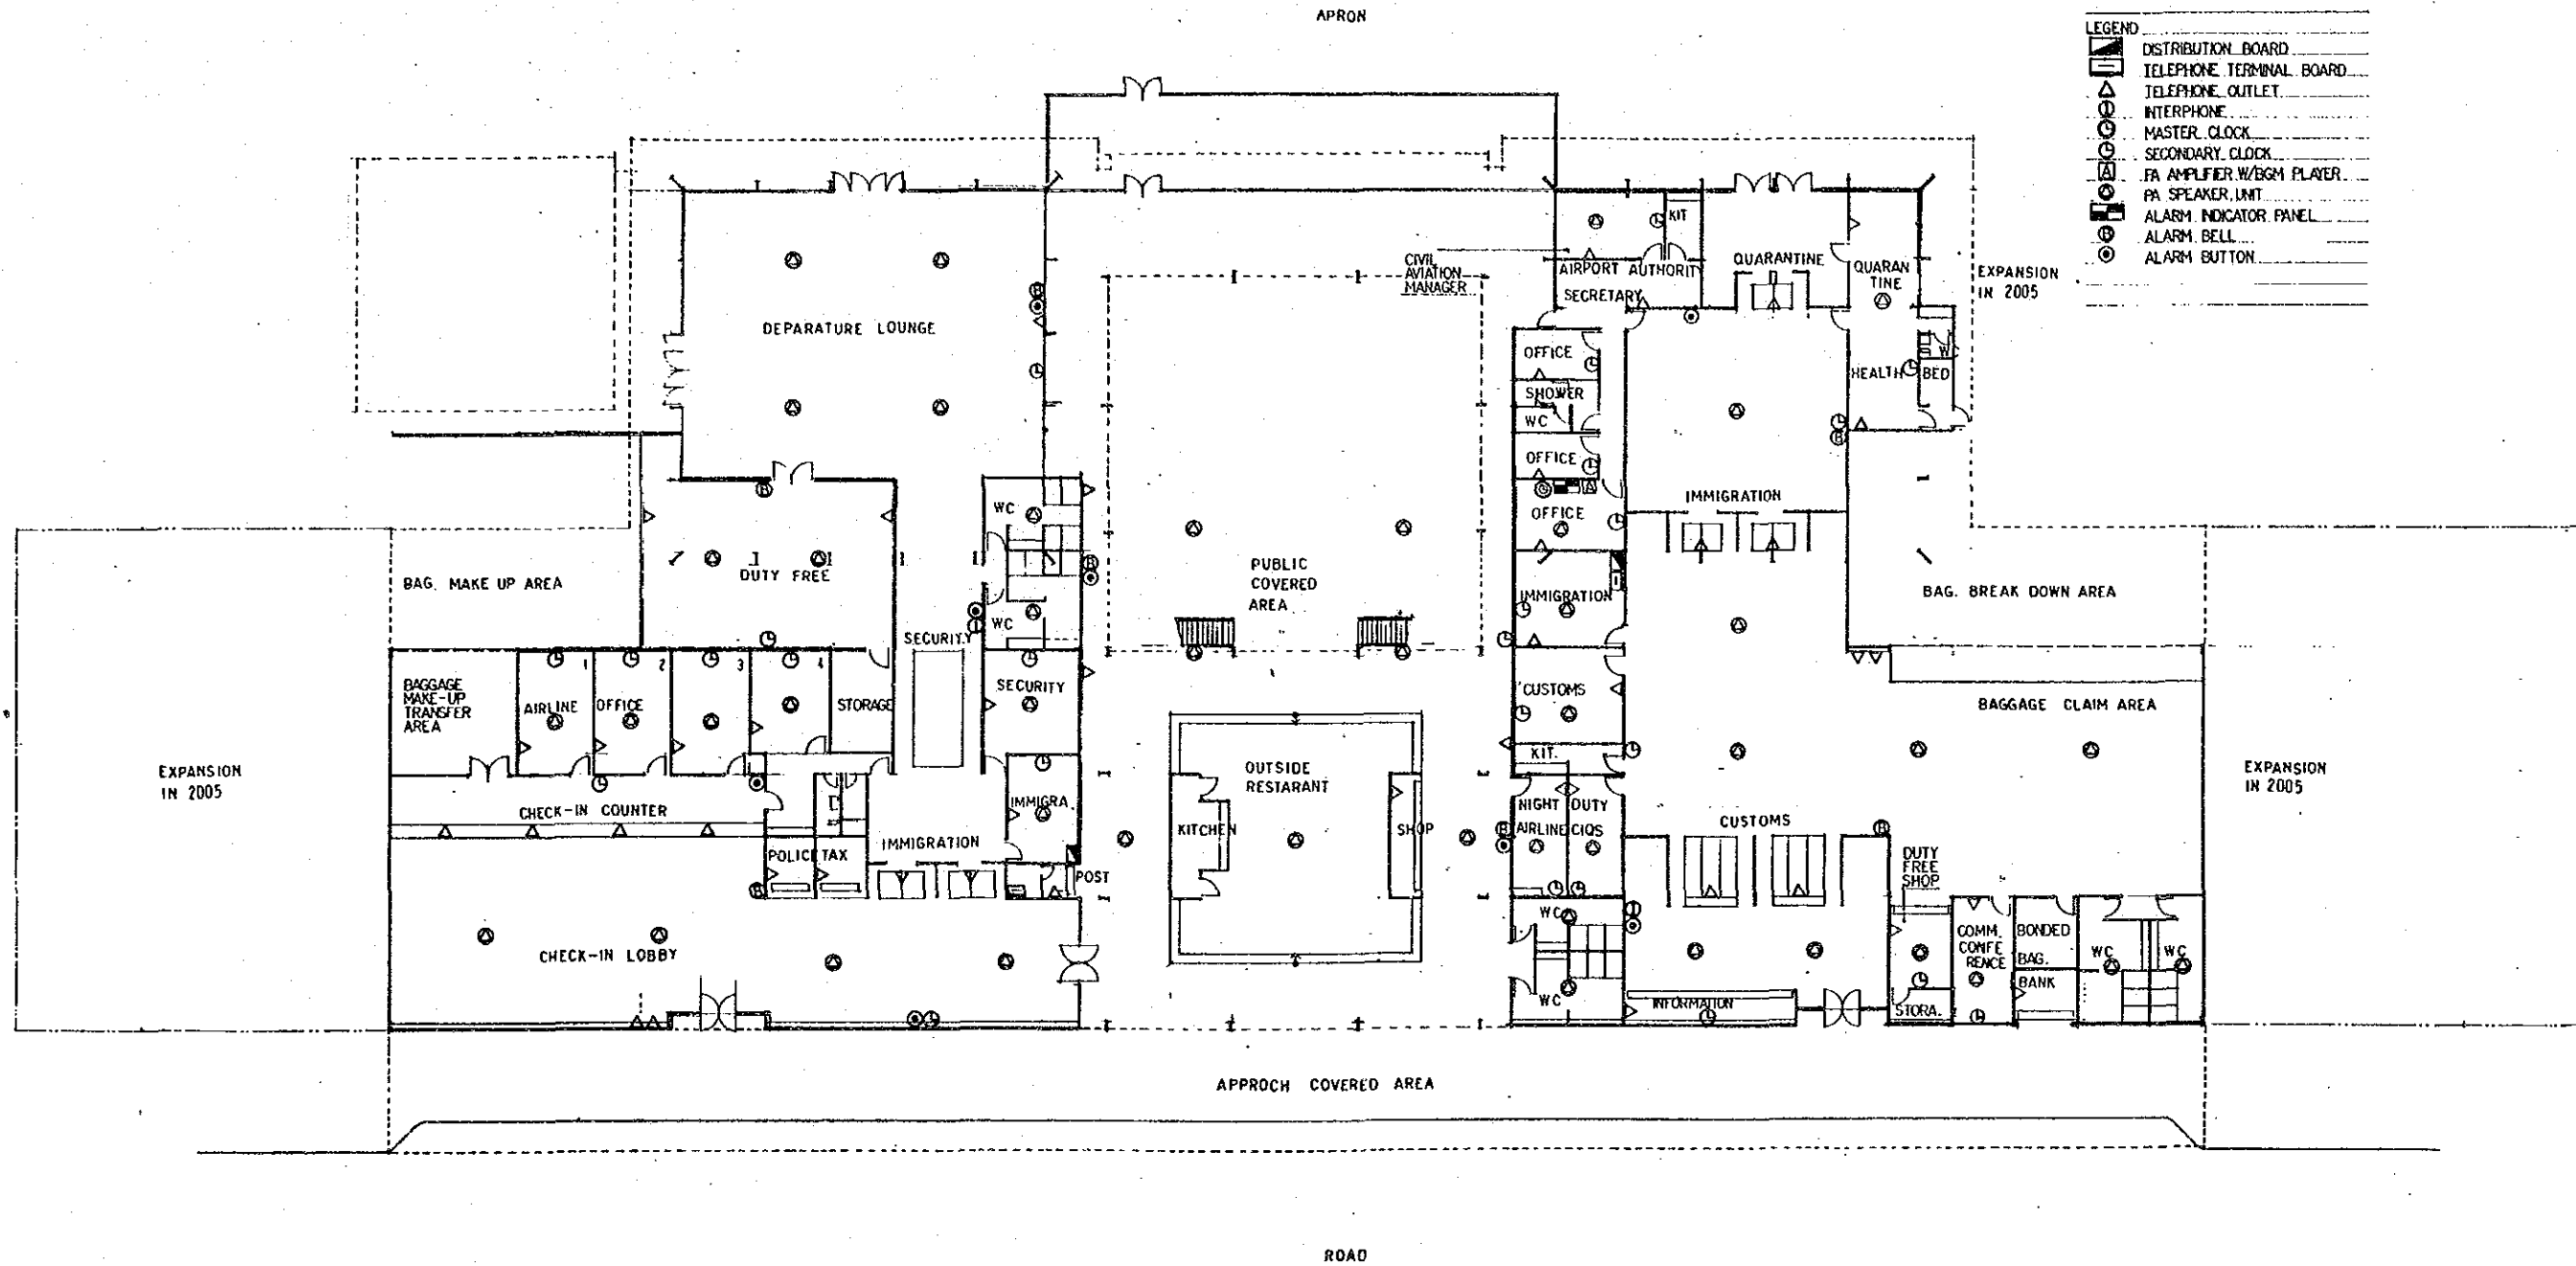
Arrangement of Electrical Equipment (First Floor)
